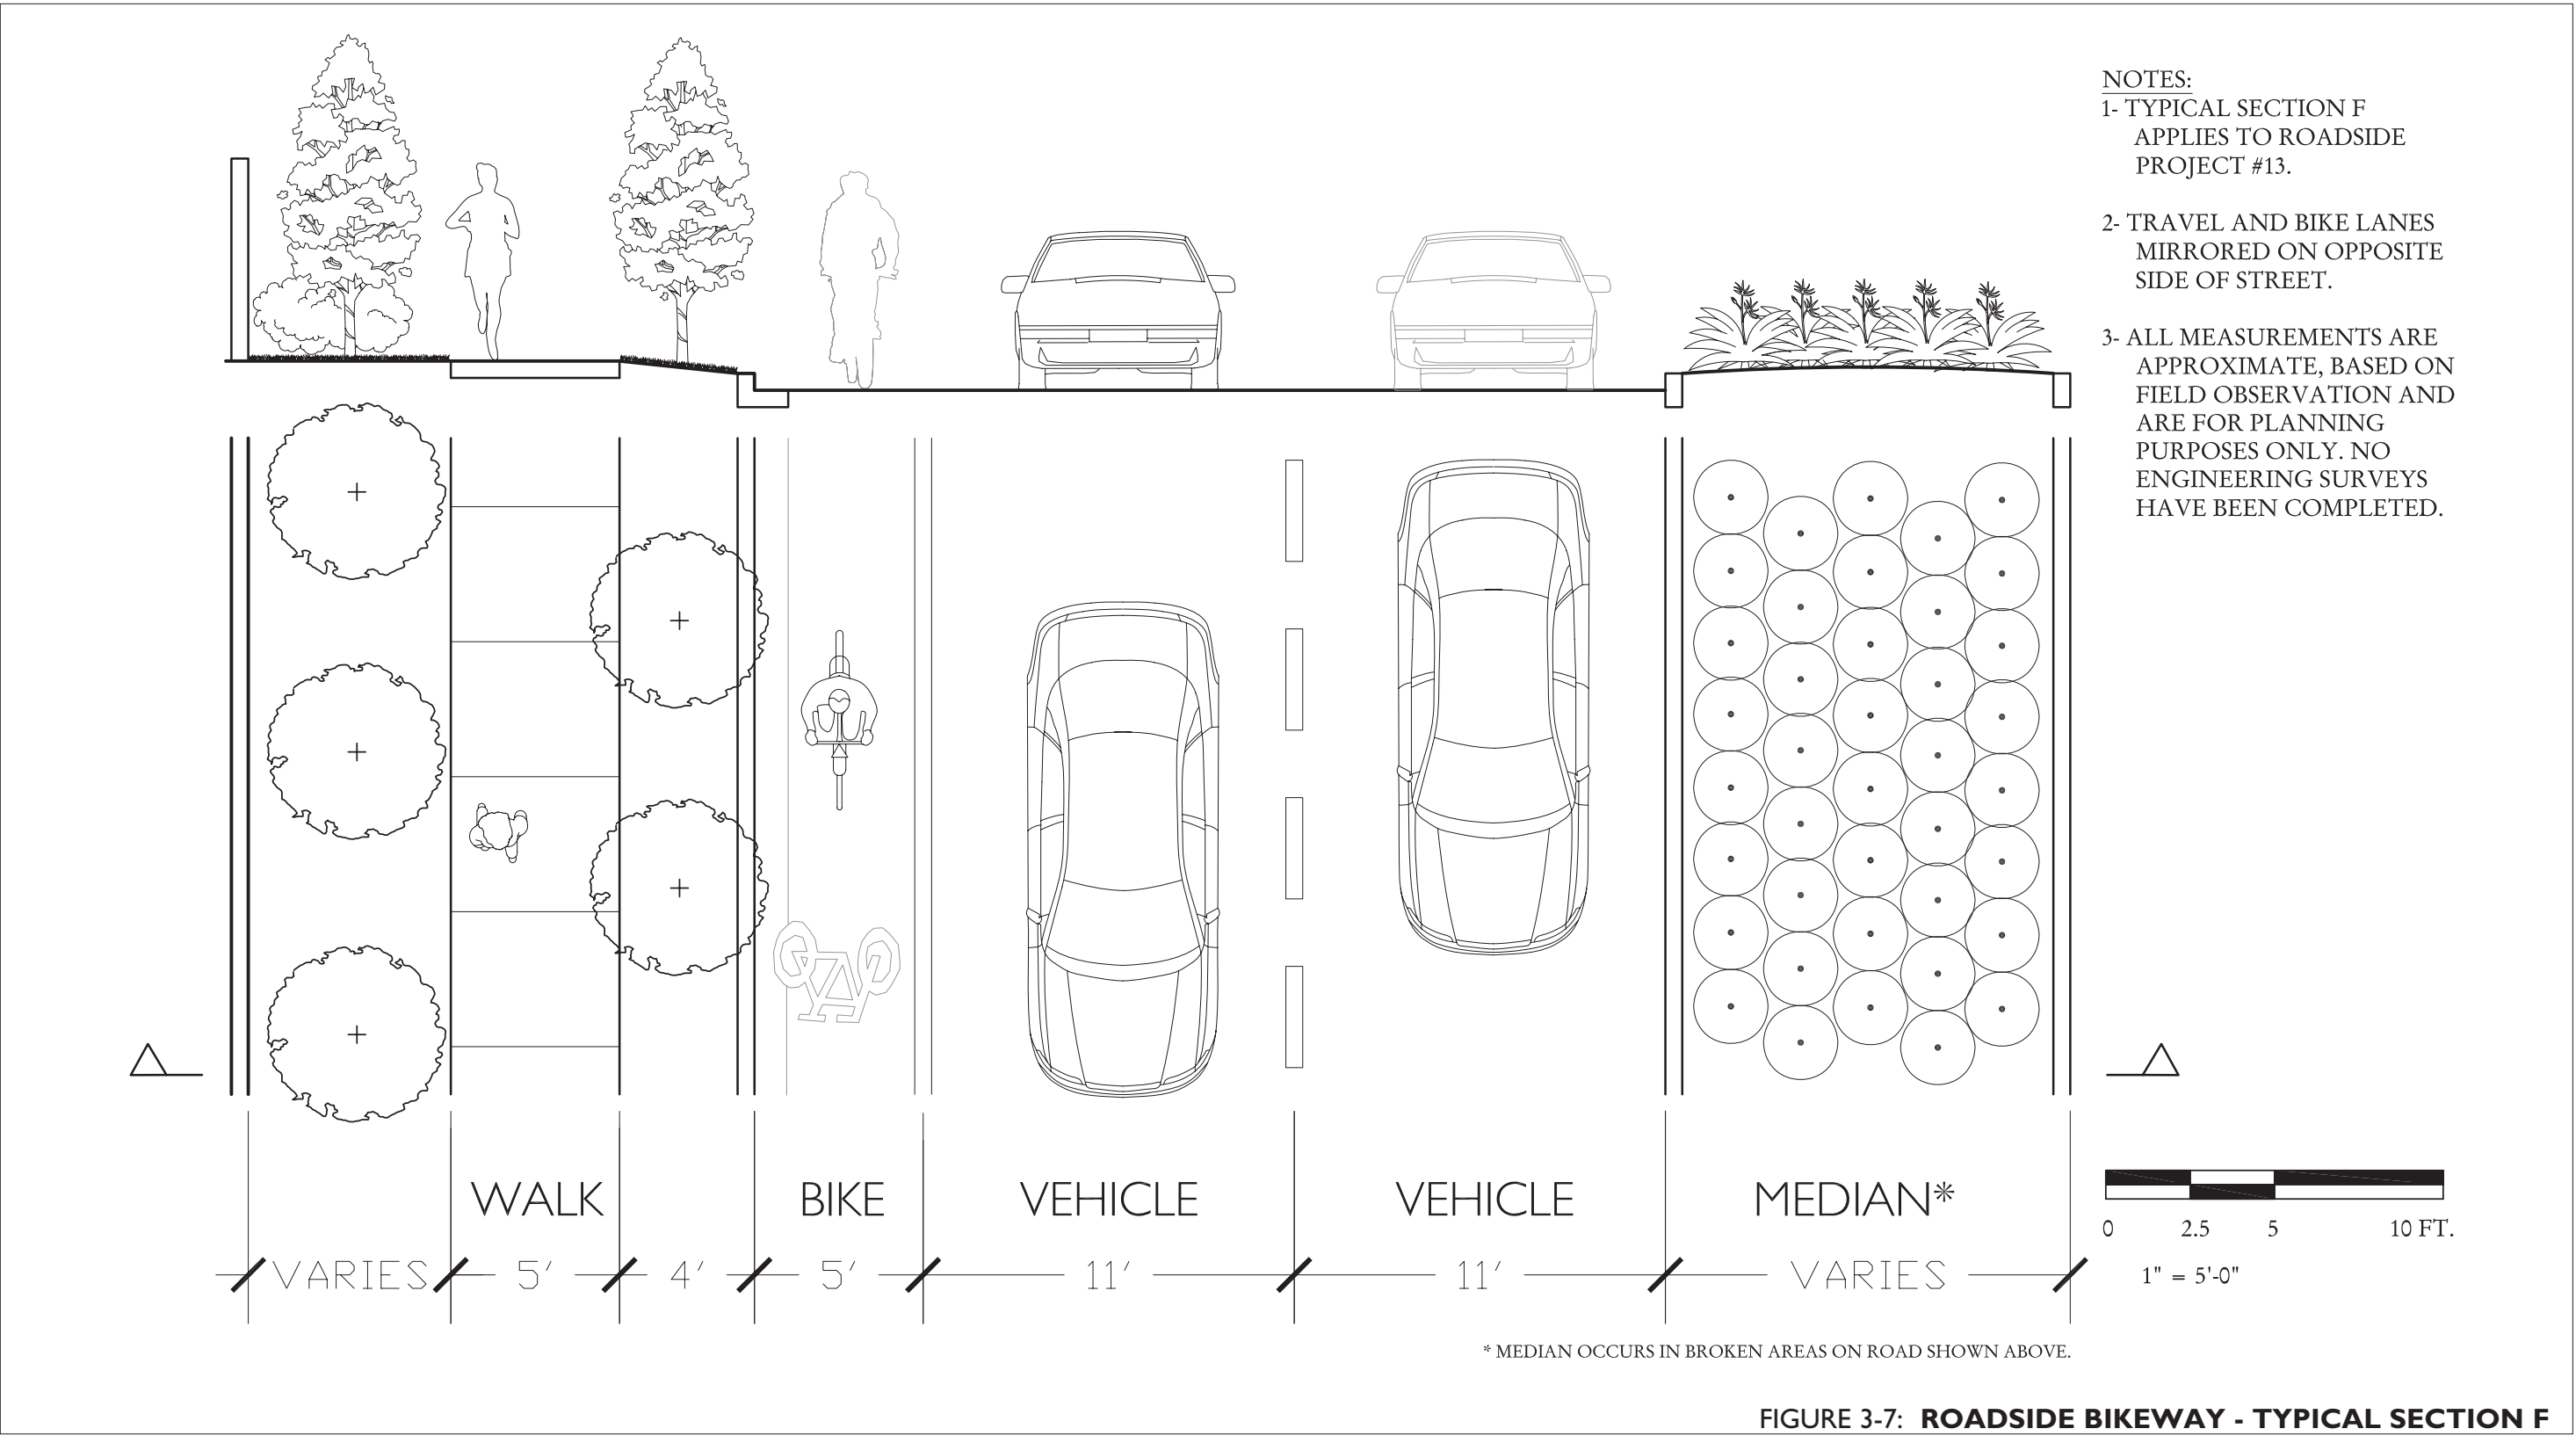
ROADSIDE BIKEWAY - TYPICAL SECTION F
